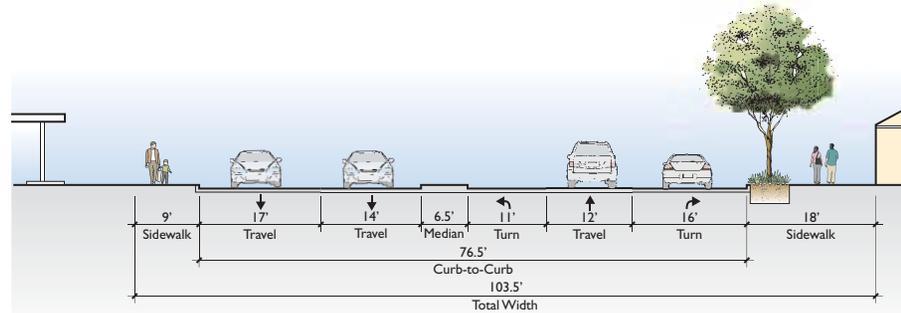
Central Healdsburg Avenue at Mill Street Intersection: Mid-term Improvements (looking north)
